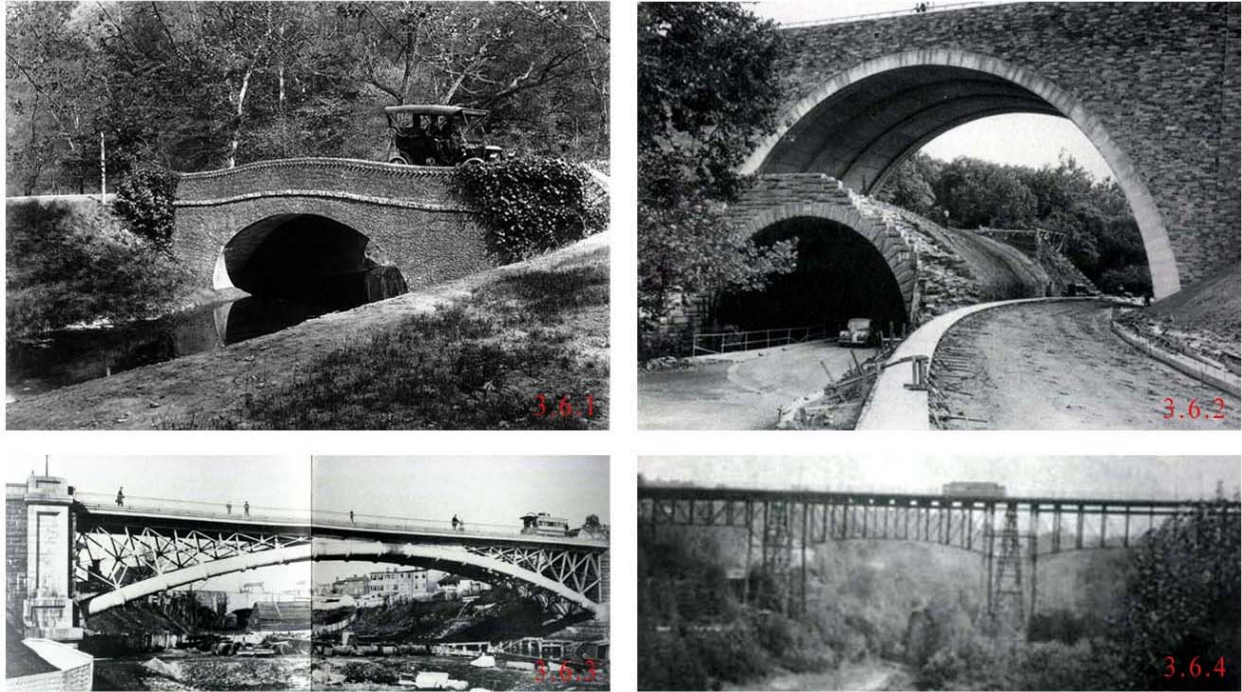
Pebble Dash Bridge, replaced in the 1960's (3.6.1); New Massachusetts Avenue bridge and old culvert, 1941 (3.6.2); Cast-iron Pennsylvania Avenue aqueduct bridge, rebuilt in 1916 (3.6.3); Iron truss Calvert Street bridge for streetcars on the Rock Creek railway line, replaced in 1935 (3.6.4)
